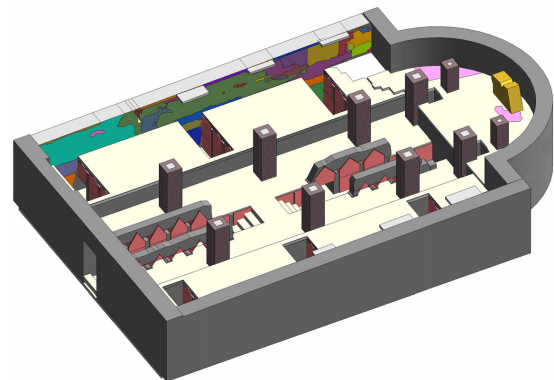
Underground oratory of San Saba, Rome: modelling in the BIM environment of the stratigraphic wall units on the north wall
